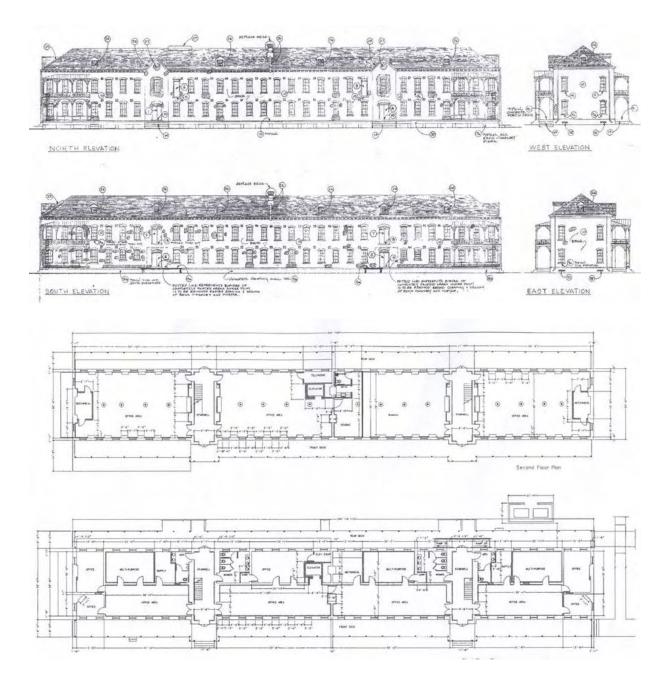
Building 56, Fort MacPherson elevations and floor plans
